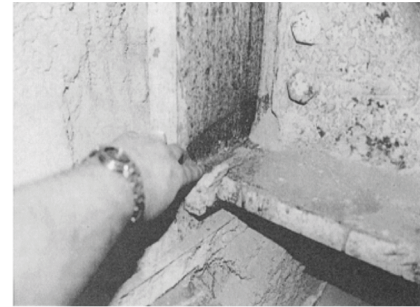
Beam-column connection damage (Kiremedjian, 1999)
